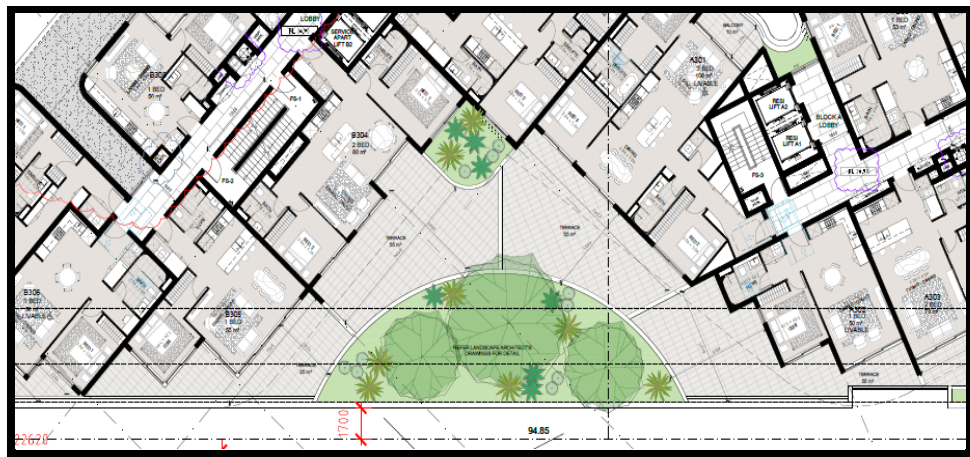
Plan showing the setbacks to Princes Highway from the podium level.
